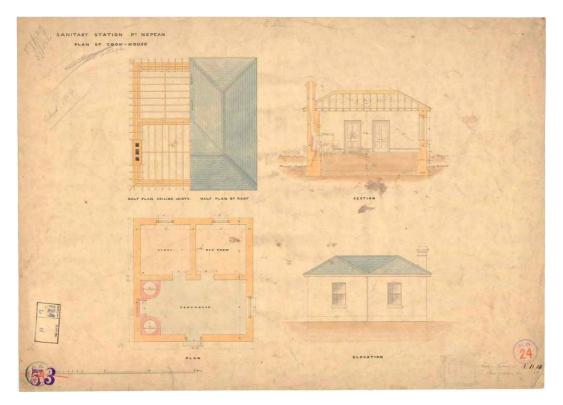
Sanitary Station Pt. Nepean. Plan of Cook-House. Drawing signed and dated by Alfred Snow, Clerk of Works, April 1858. The circular elements shown on the front room plan are probably iron boilers referred to in the 1873 description. Source: National Archives of Australia.
